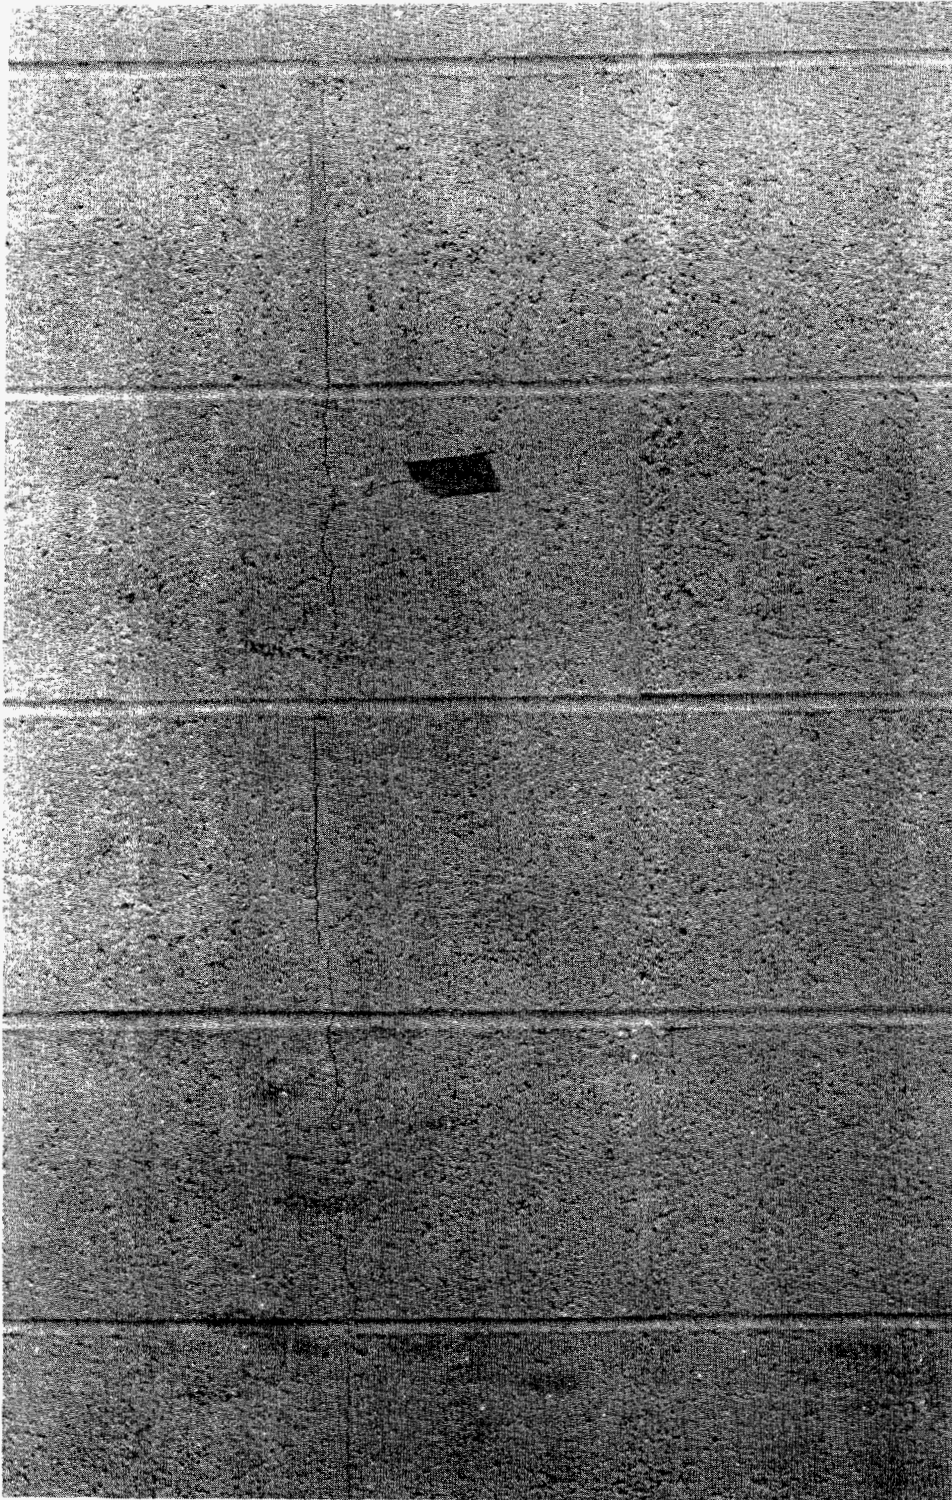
Building 751, north side, 0.18 cm/sec.
